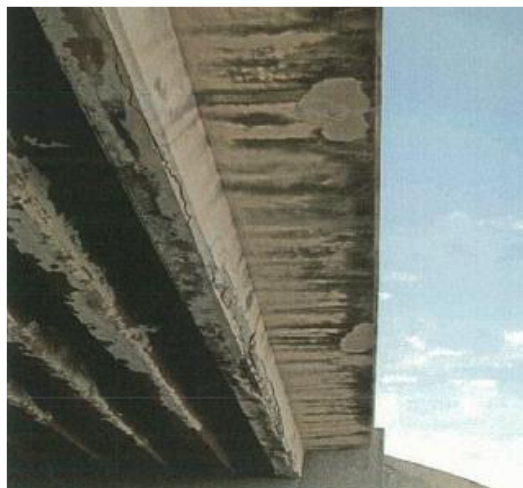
View of cantilever slab and main beams (north side): Longitudinal crack along the corner rebar, dark and white steins on beams and cantilever slab
